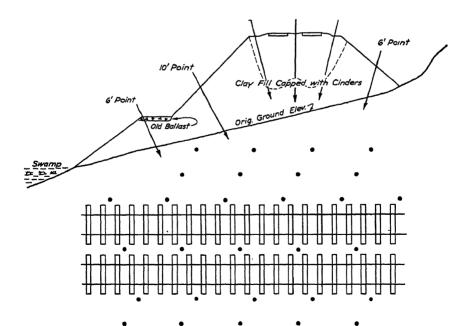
Pressure Grouting. Fill Sliding on Foundation and Typical Injection Plan.
